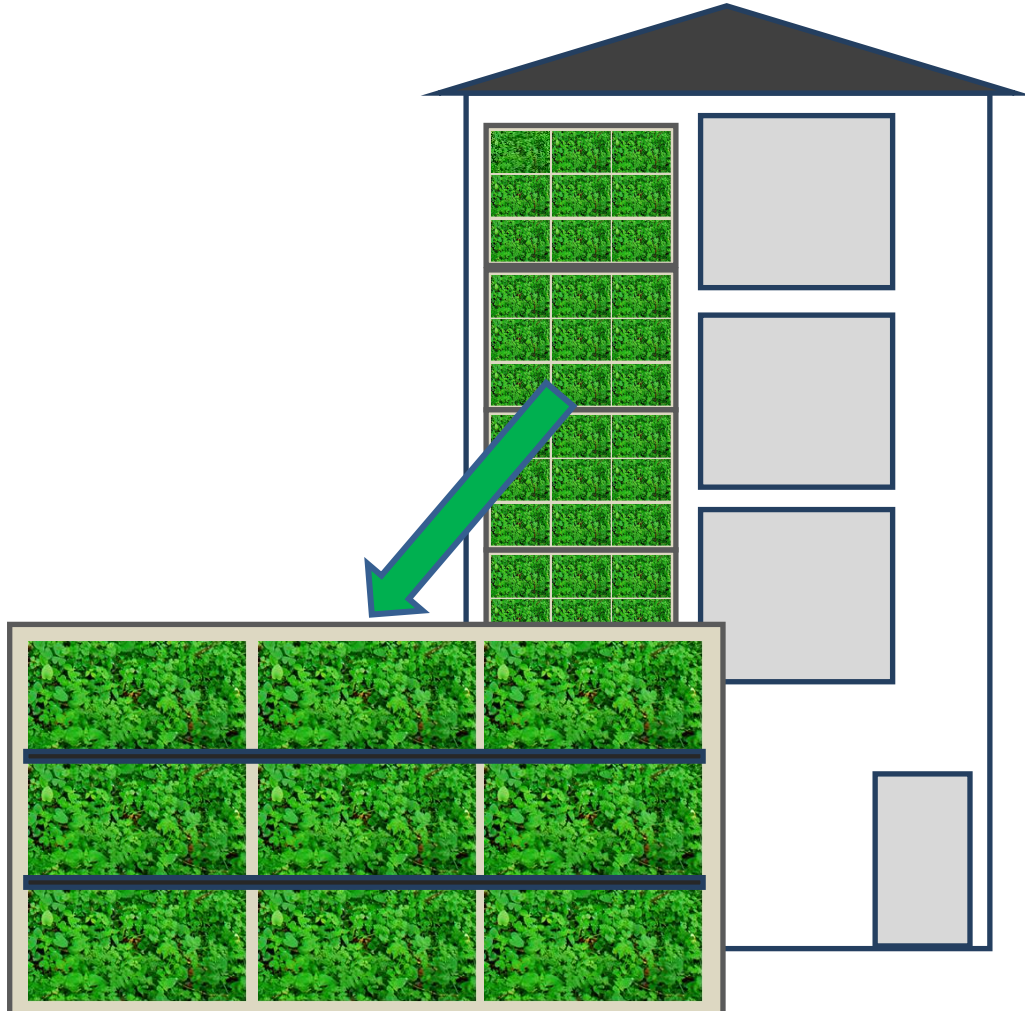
Living walls; Greenery are planted in special cover materials that are embedded on the building walls
